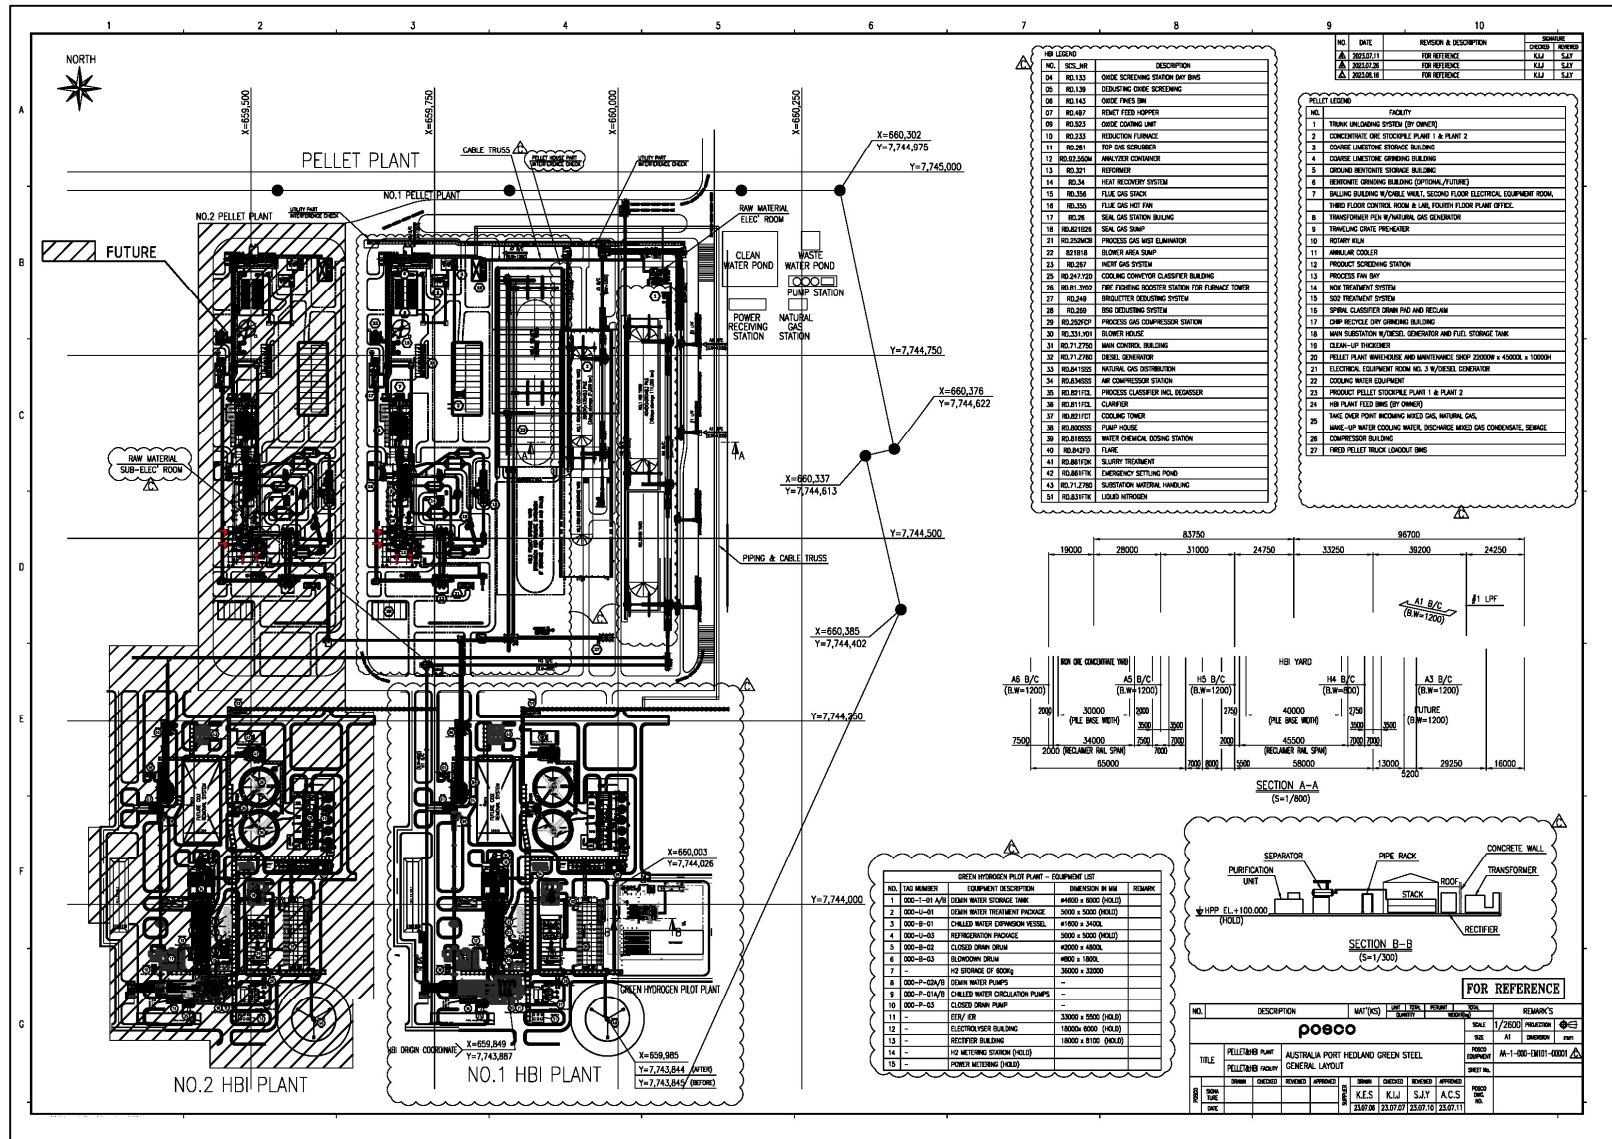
GREEN STEEL PLANT LAYOUT
